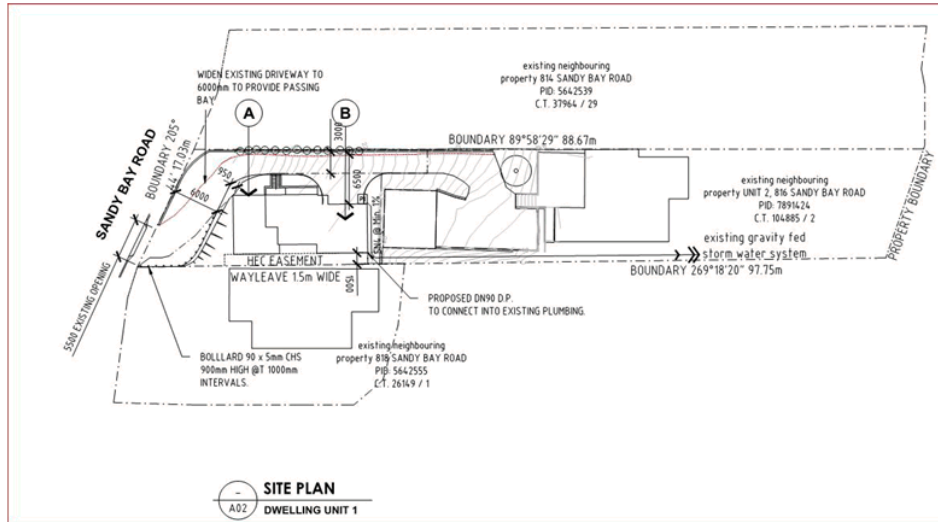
Proposed Site Plan showing the proposed works to driveway and location of the dwelling extension
